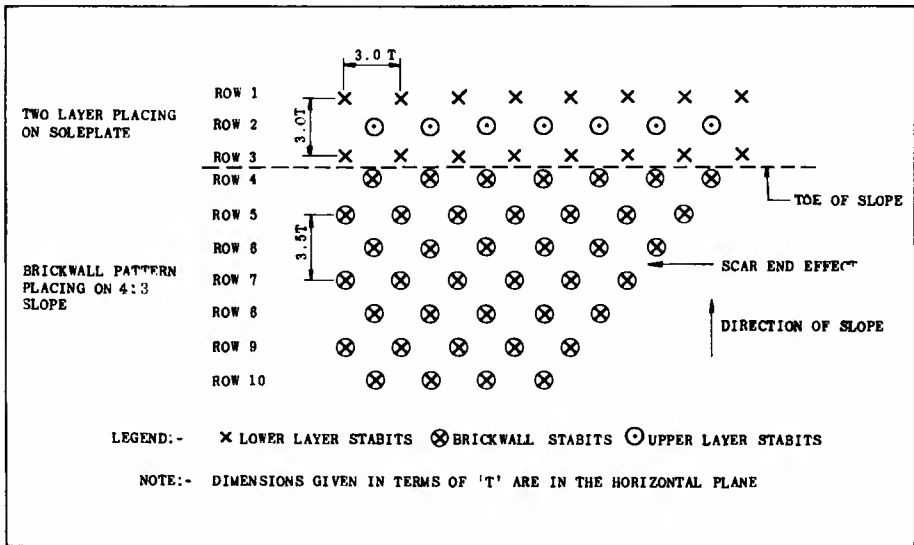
DIAGRAMMATIC PATTERN FOR BRICKWALL PLACING
